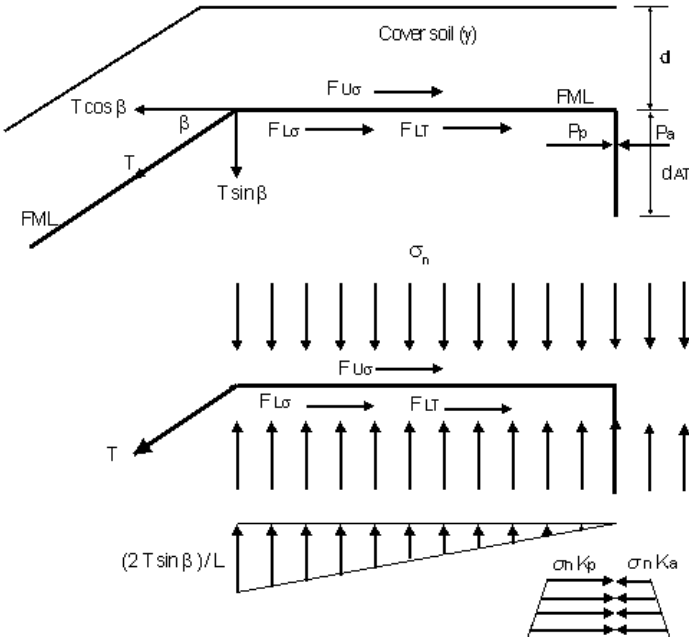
Cross section of anchor trench section and related stresses and forces involved
